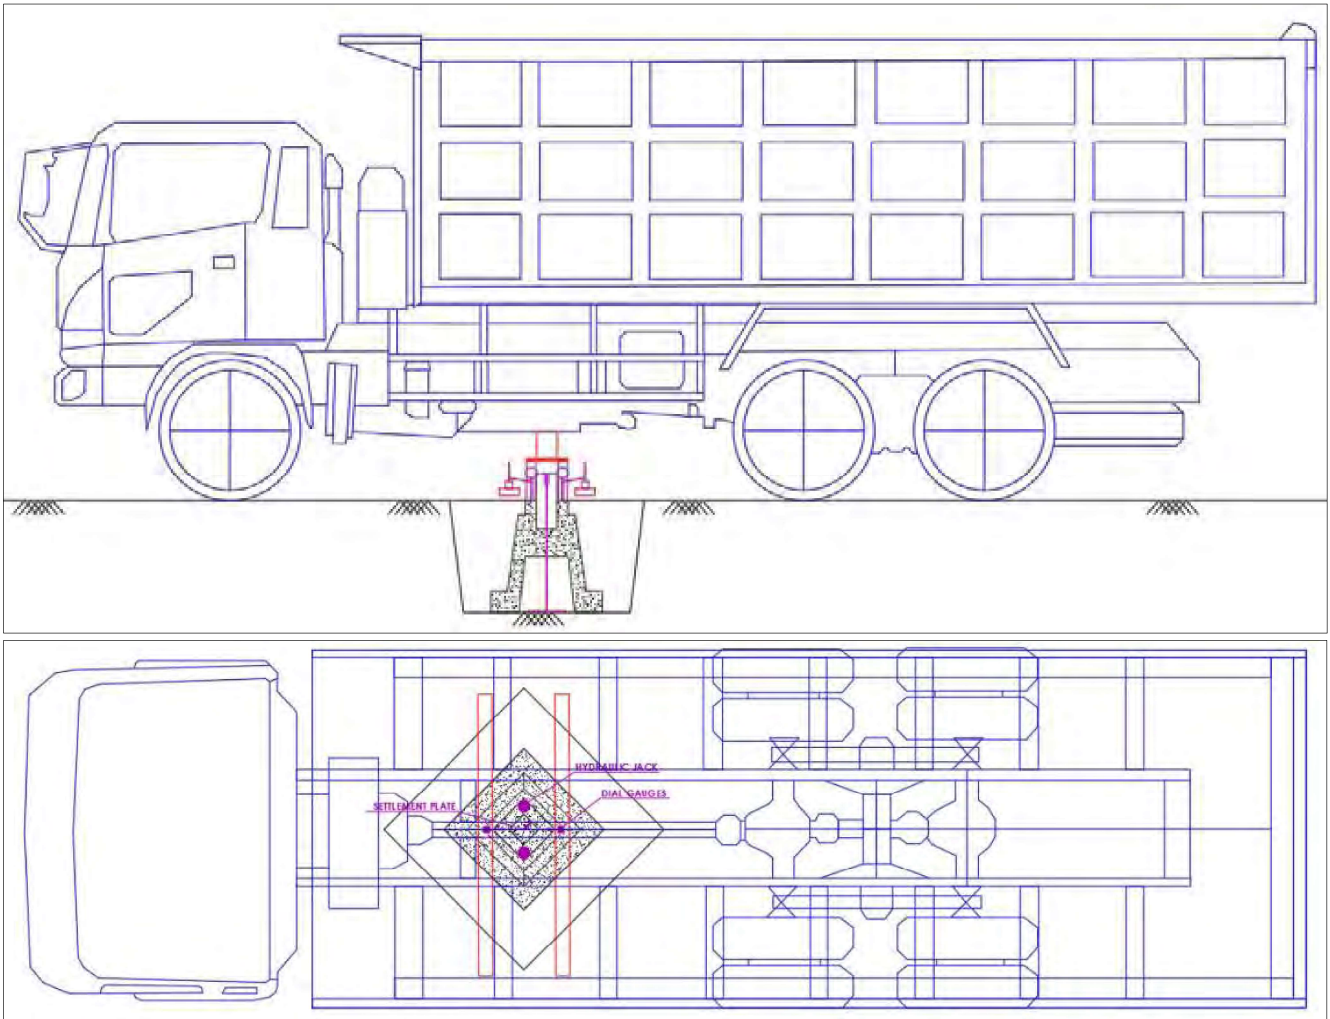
Load test configuration in side view (upper) and top view (lower)
